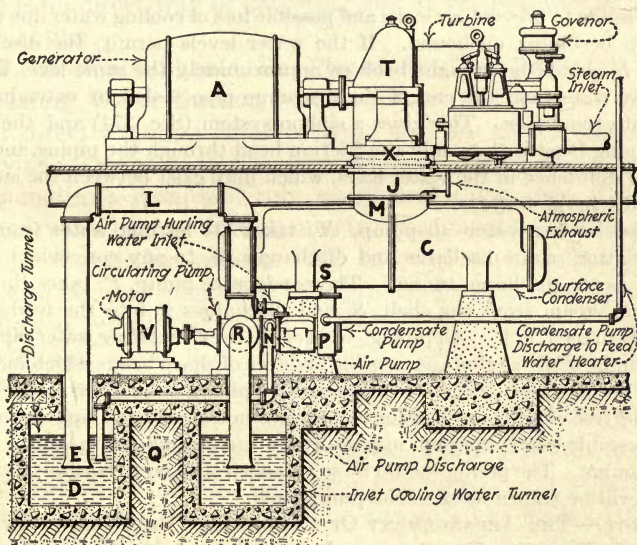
A.—Westinghouse-LeBlanc Surface Condenser Installed For Service With Turbo-Generator Unit.
